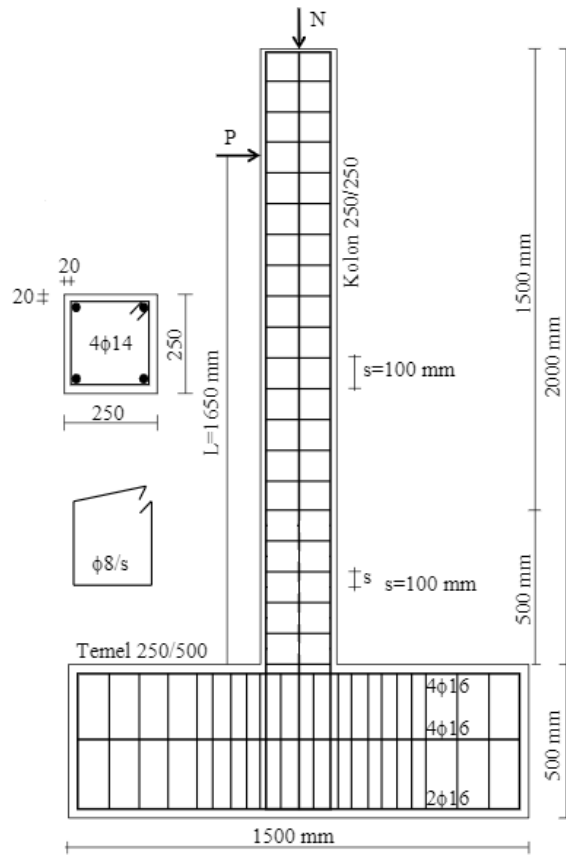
Reinforced concrete column cross-section and reinforcement plan.
